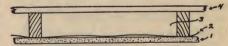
Insulation board on inside of studs (rat haven). 1. One-inch insulation board. 2. Building paper, north wall and side walls near roosts. 3. Circulating air space. 4. Siding
